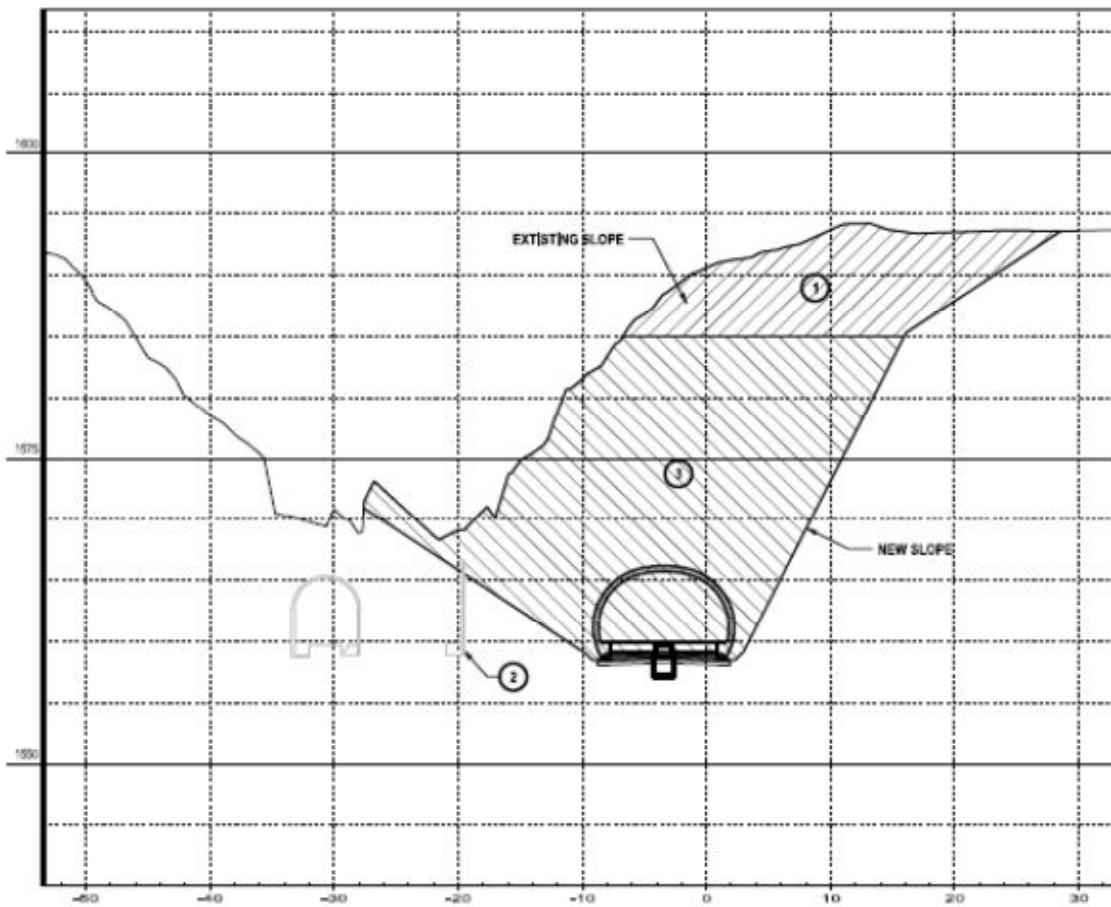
Existing and New Tunnel cross-section at the Eastern portal (Aurecon; 2014).
